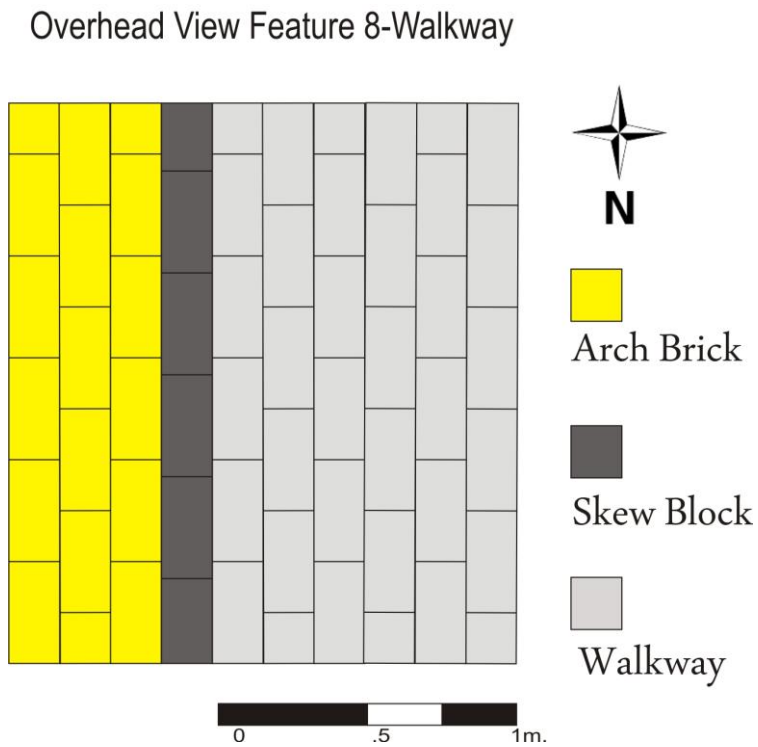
Overhead view of Feature 8 and adjacent kiln space on the east wall of the barrel vault of the Pottersville kiln. The walkway allowed for movement along the kiln exterior.
